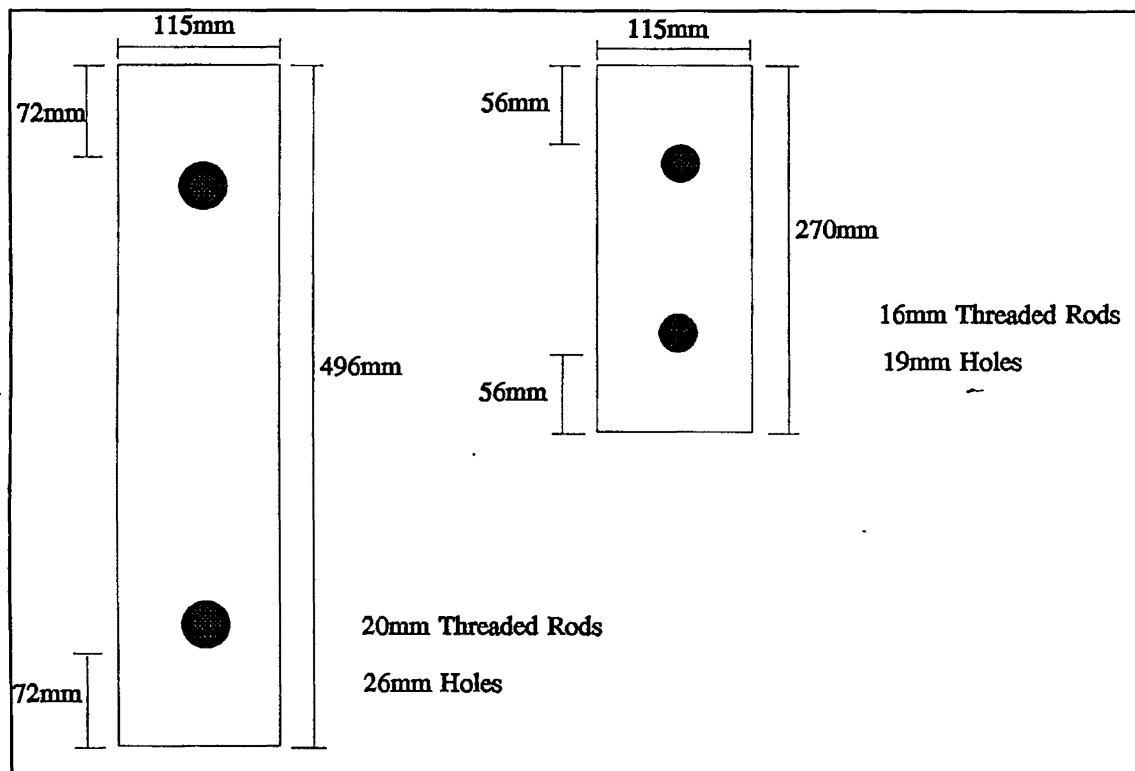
Cross Sections of Aqua Gym Connections, Modelled Using TASEF (edge distance dimensions to outside of epoxy).
